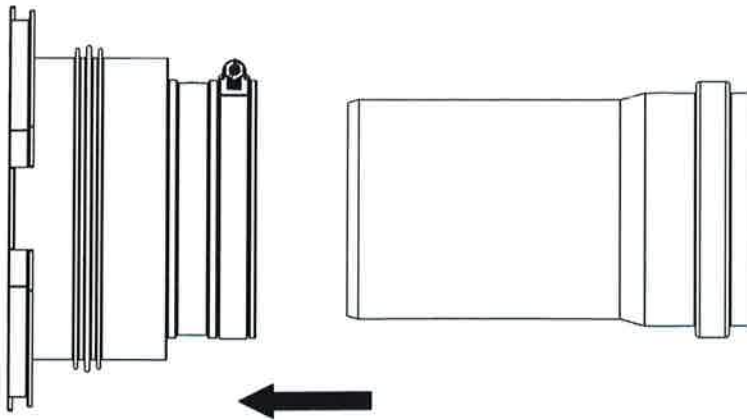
Connection between the universal wall entry Hauff-UDM DN100/WS 200mm and the KG-pipe (manufacturer's drawing).
